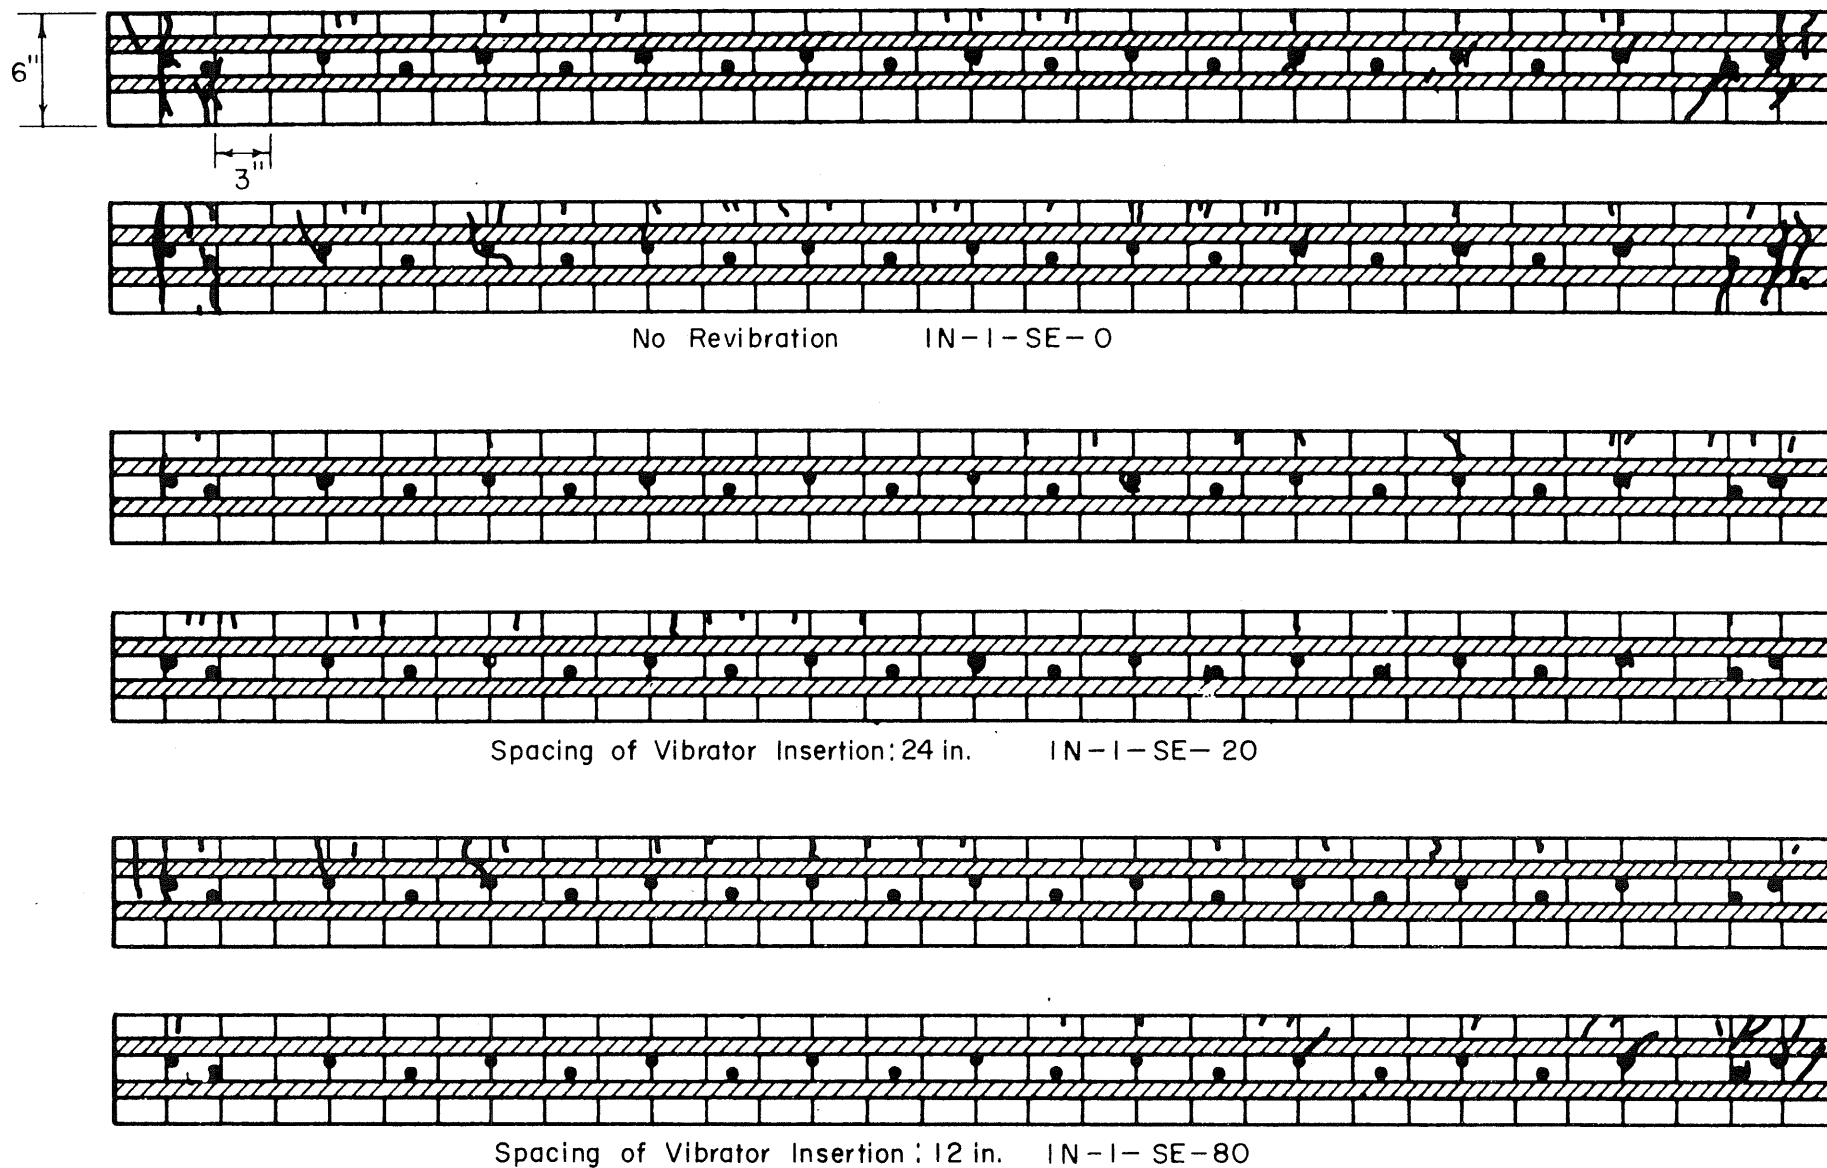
SECTIONS OF SEVERELY CRACKED CONCRETE SLABS - INTERNAL REVIBRATION AT LOW OR HIGH ENERGY LEVEL 4 HOURS AFTER MIXING
